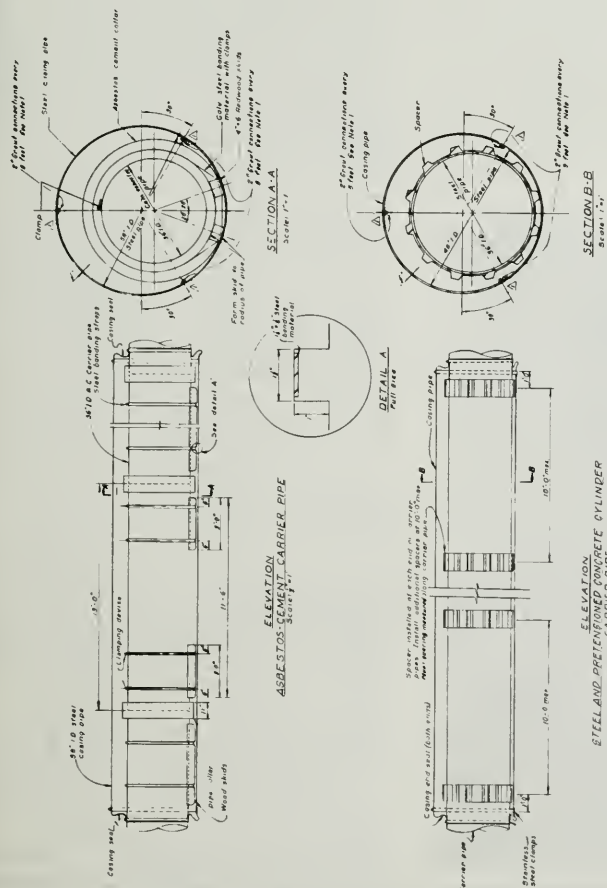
Pretensioned-Concrete Cylinder Pipe Details
